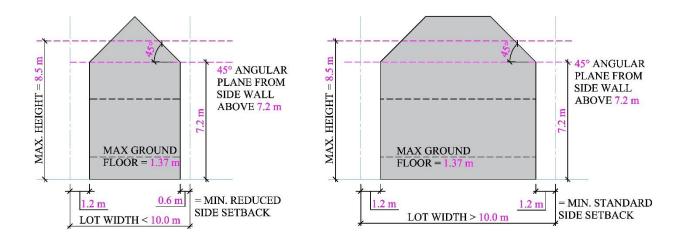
K.F7: Perpendicular Massing on Pitched Roof Building
